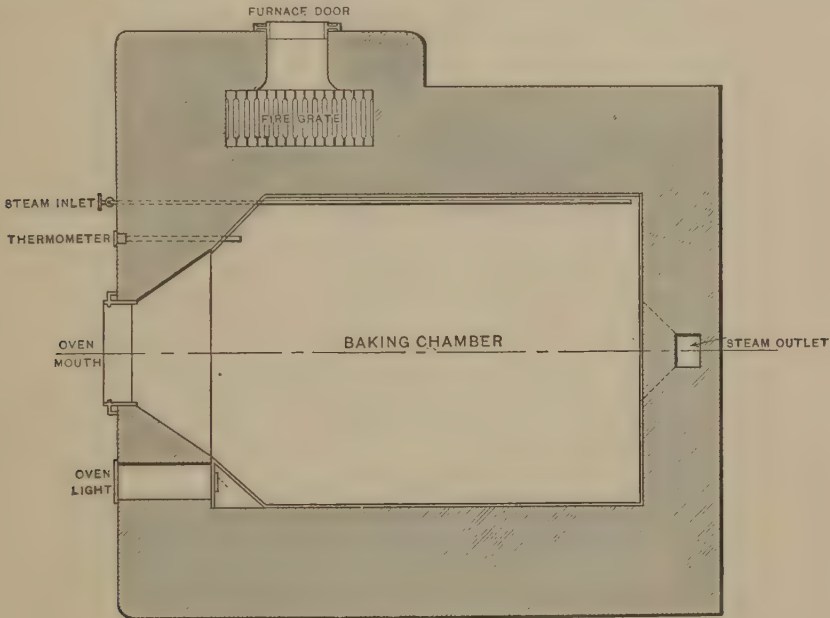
"Viennara" Patent Steam-pipe Oven: Sectional Plan
